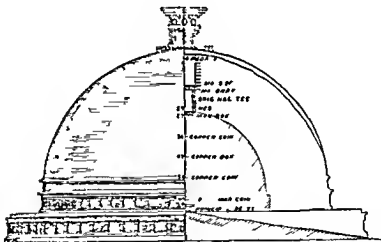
Restored Elevation of Tope at Manikyala (Fergusson)
